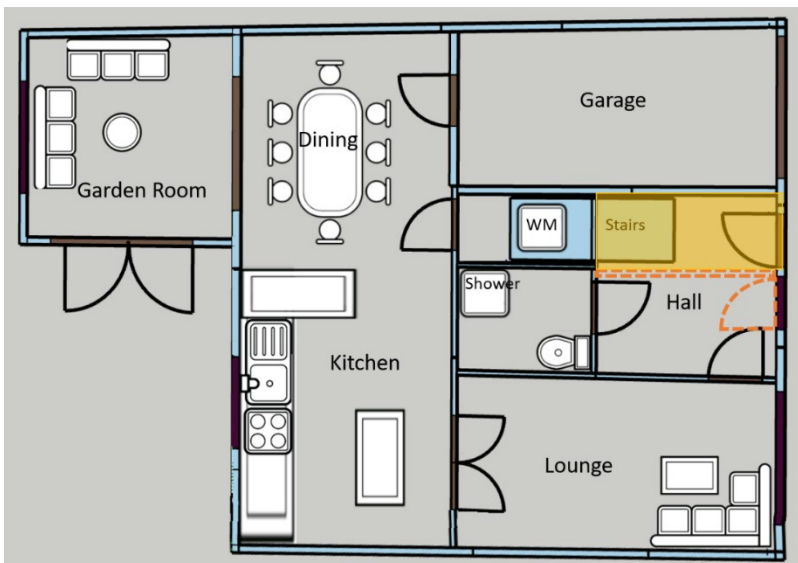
Ground floor modification. A new party wall is built and a window is transformed into an entrance door. The hallway of the upstairs dwelling is marked in yellow and the rest of the ground floor would be one dwelling.
